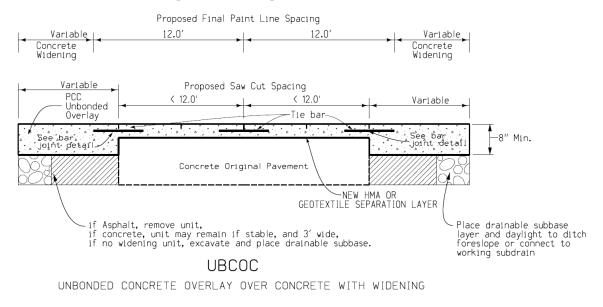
Cross-section of a proposed UBCOC design with paved widening/shoulder unit and placement of separation layer and tie bars
